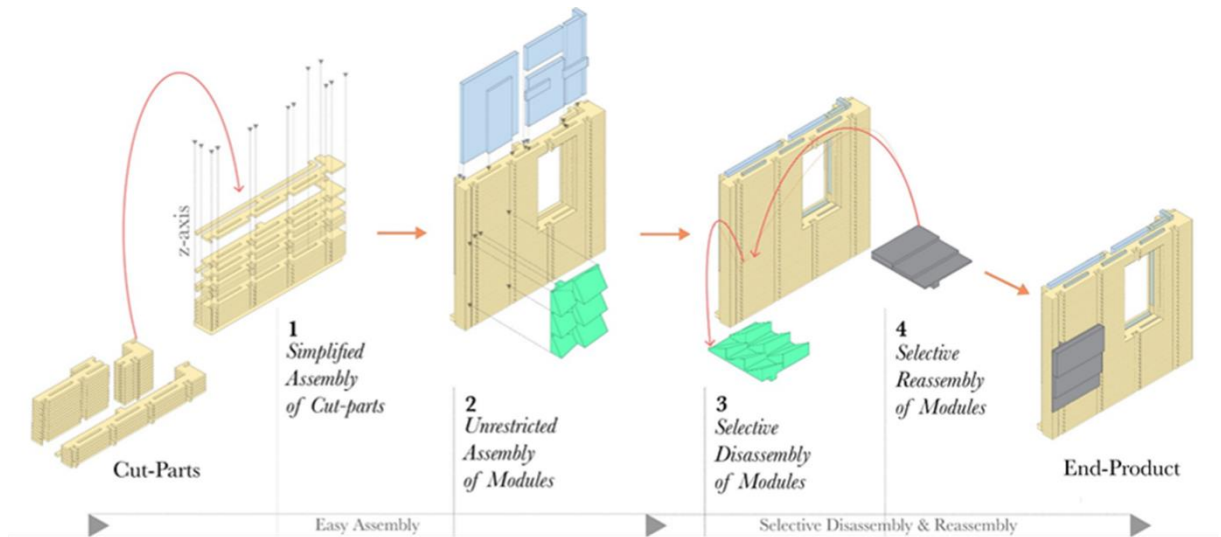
STAGE 4: Prototyping of study scale wall panels by assembly, disassembly & reassembly
